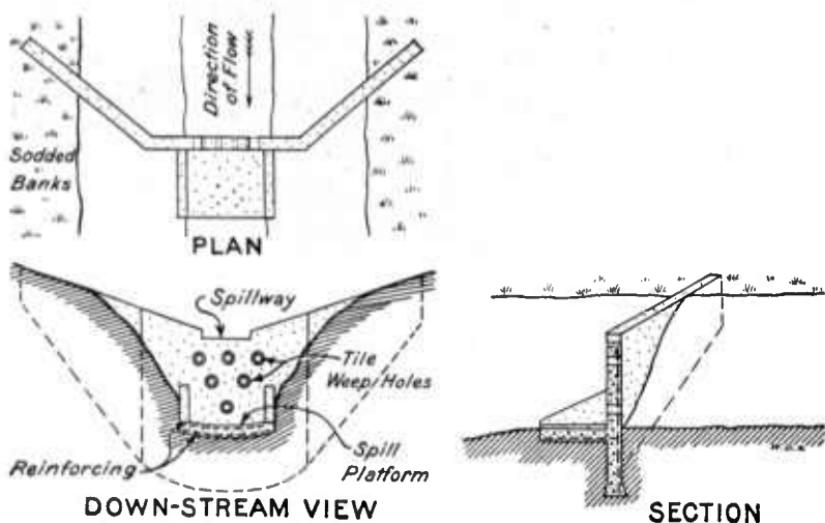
Plan, section, and downstream view of a concrete dam especially designed to guard against the common causes of failure.<sup>1</sup>
